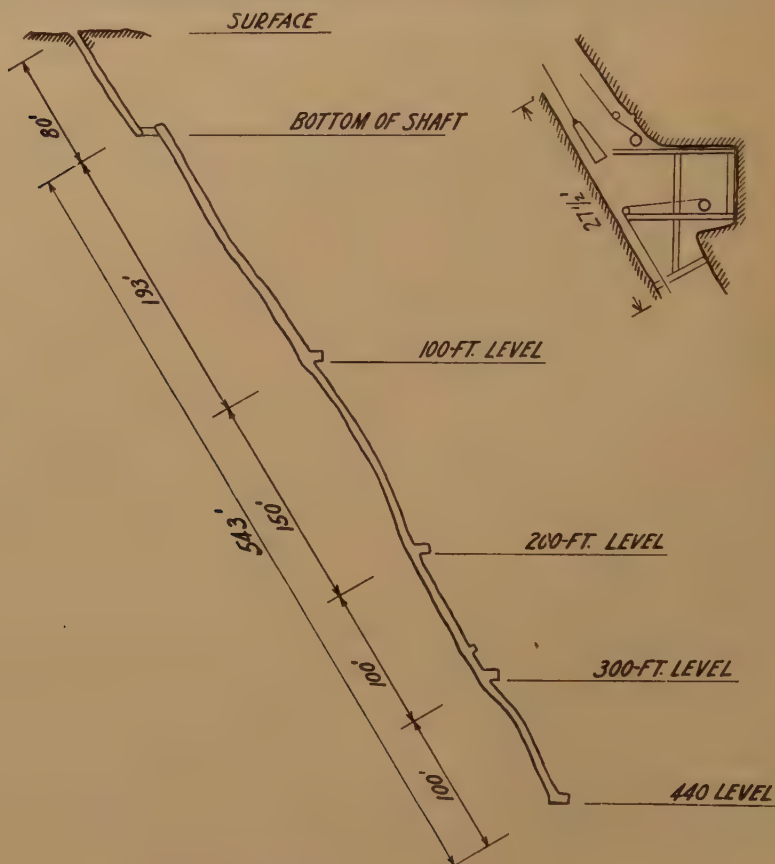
SECTION THROUGH 540-FOOT AIR RAISE.
